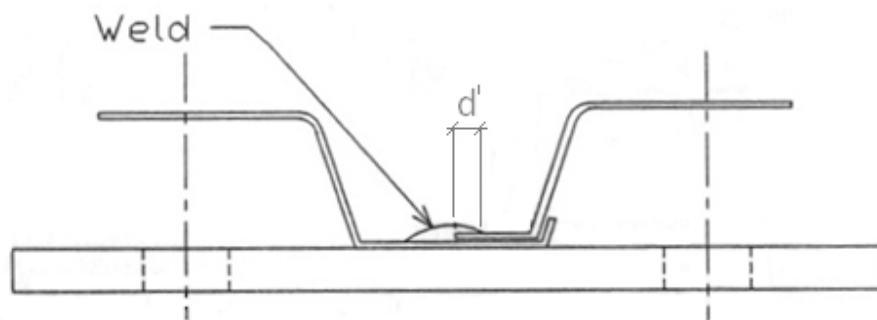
Cross-section of lap connection specimens (LaBoube and Yu 1991)
